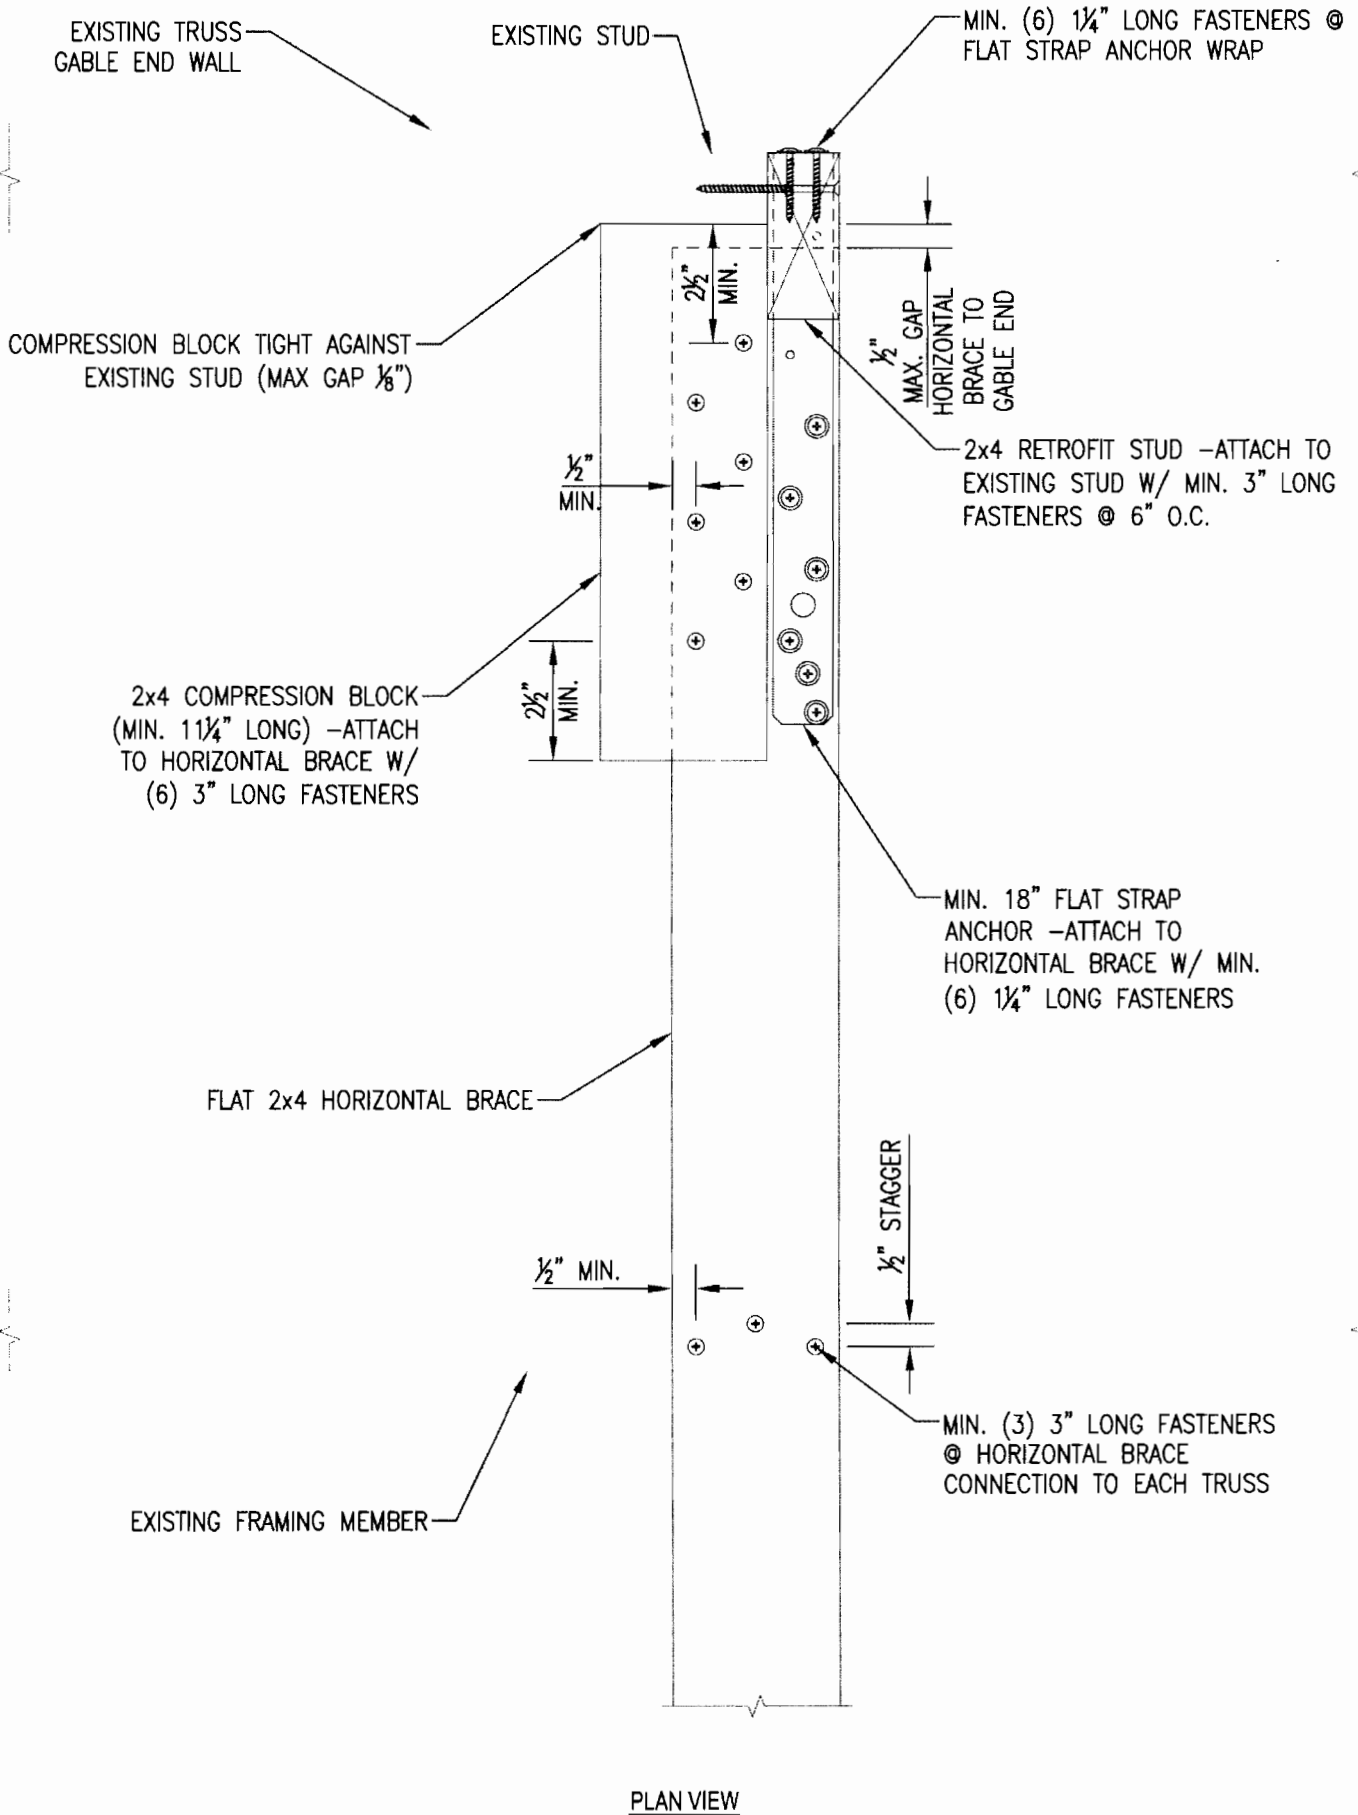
DETAILS OF STRAP & COMPRESSION BLOCK INSTALLATION - 2x4 RETROFIT STUD
